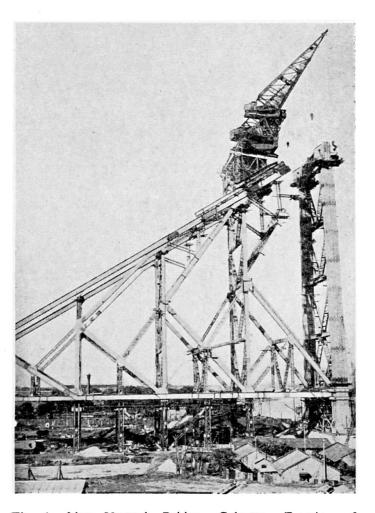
New Howrah Bridge, Calcutta. Erection of anchor arm on falsework. Note fleeting tracks for creeper crane and temporary members supporting top chord
